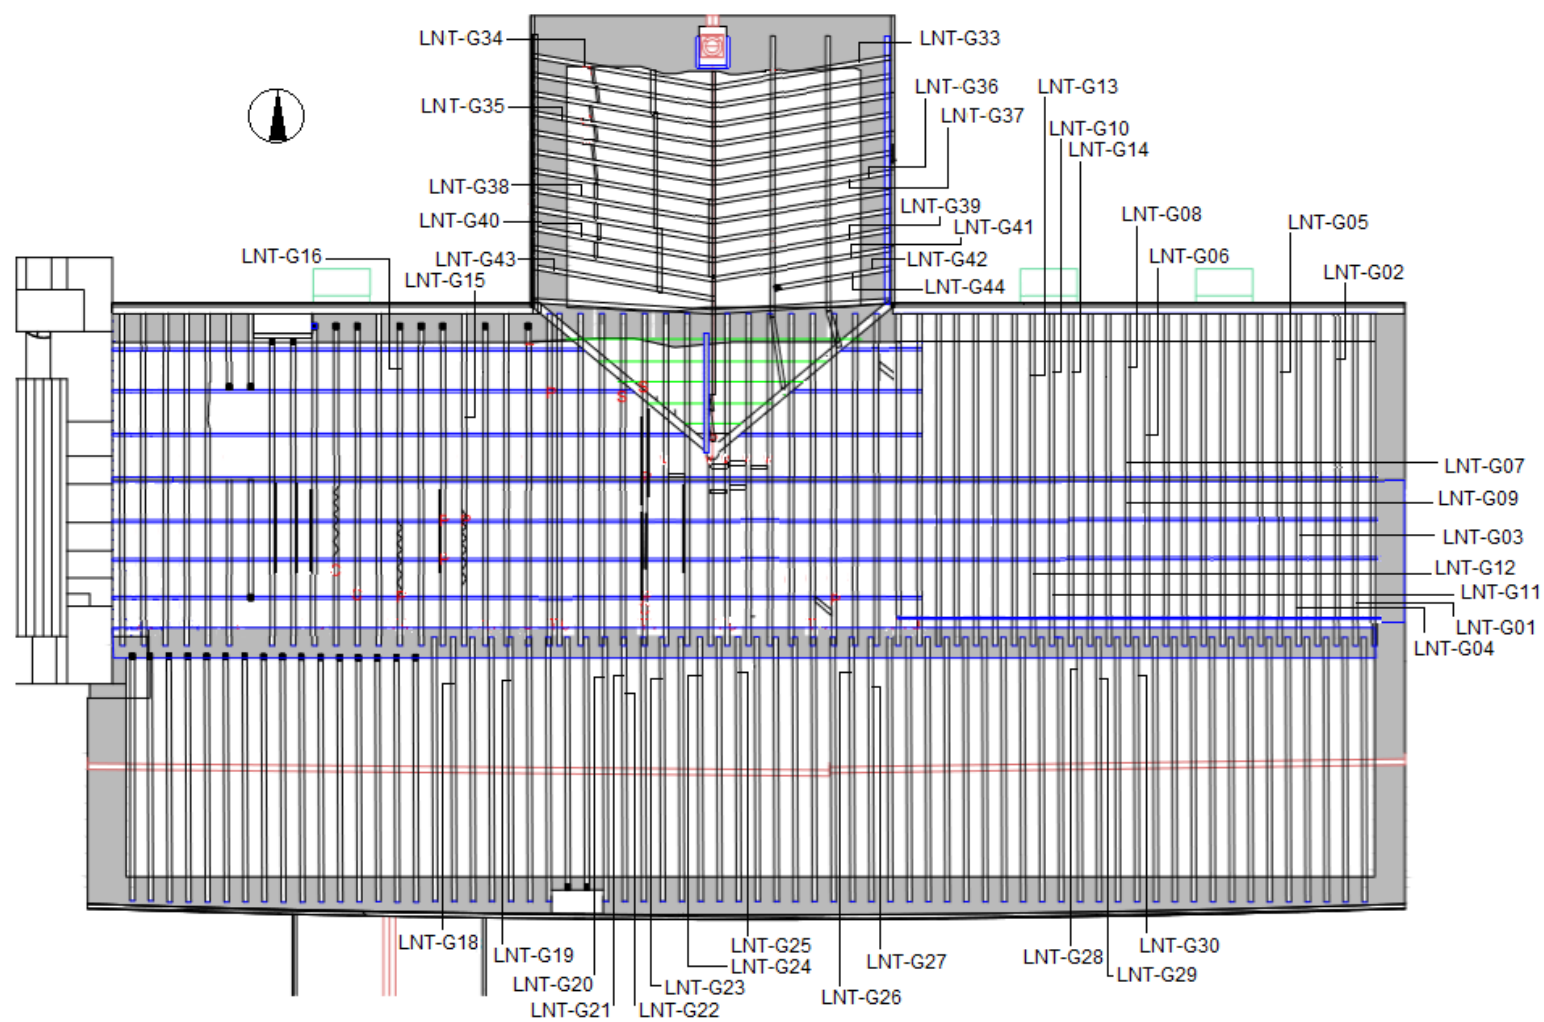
Roof plan, showing the location of sampled timbers LNT-G01–16, LNT-G18–30, and LNT-G33–44 (after Chadburn Conservation Architect 2015)
